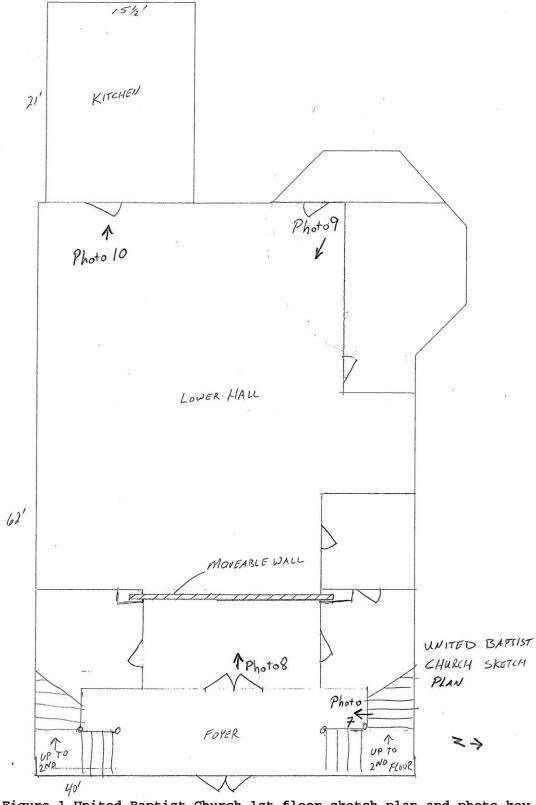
United Baptist Church 1st floor sketch plan and photo key
